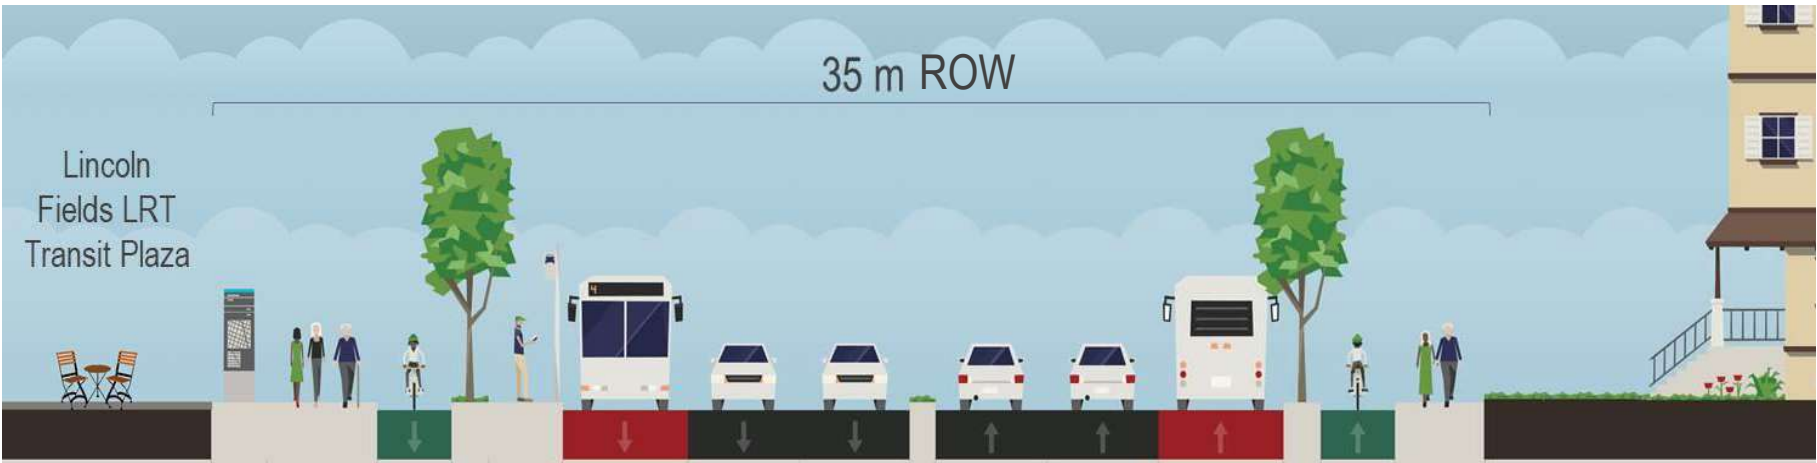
Carling Avenue street cross-section (SURP, 2019)
